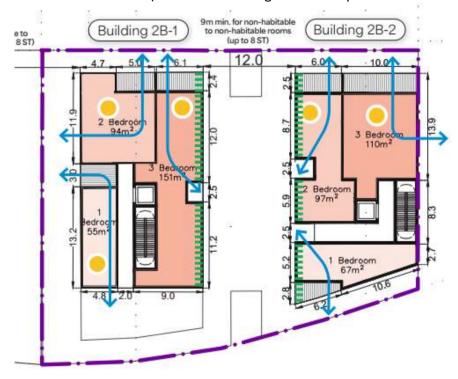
12m separation between proposed towers 2B-1 and 2B-2 does not demonstrate compliance with the ADG
